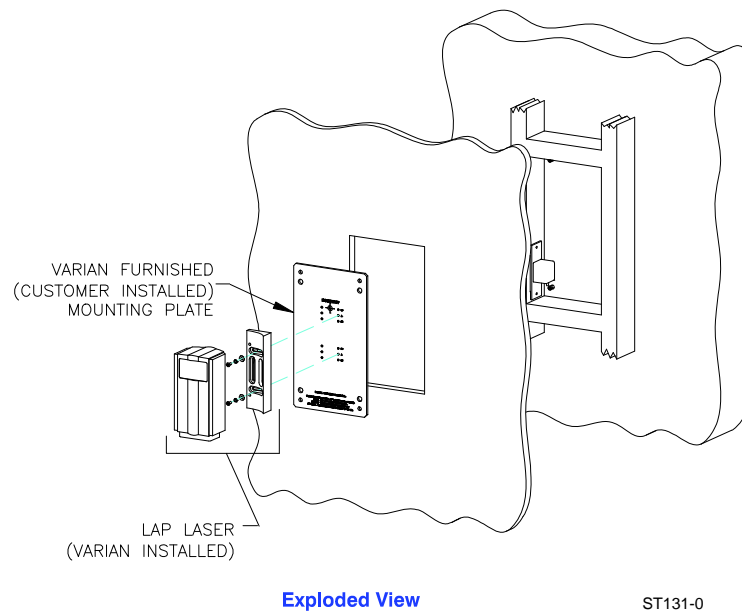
Laser and Mounting Plate (Typical) – Exploded View
